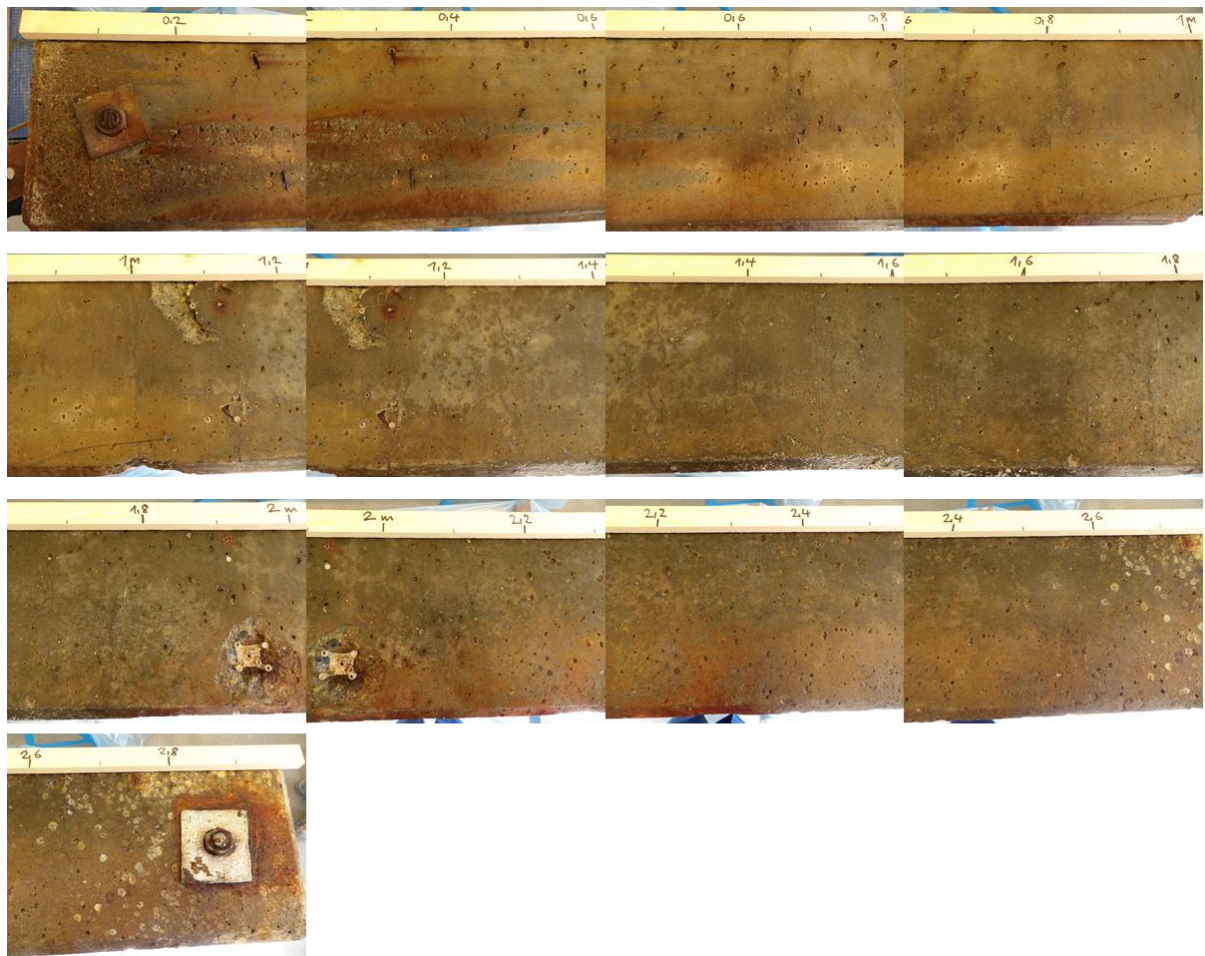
Pictures of the top concrete surface of concrete Beam F taken after arrival in the laboratory at NTNU, distance in meters (Photos: Ragnhild Moastuen and Solveig Myklebust)
